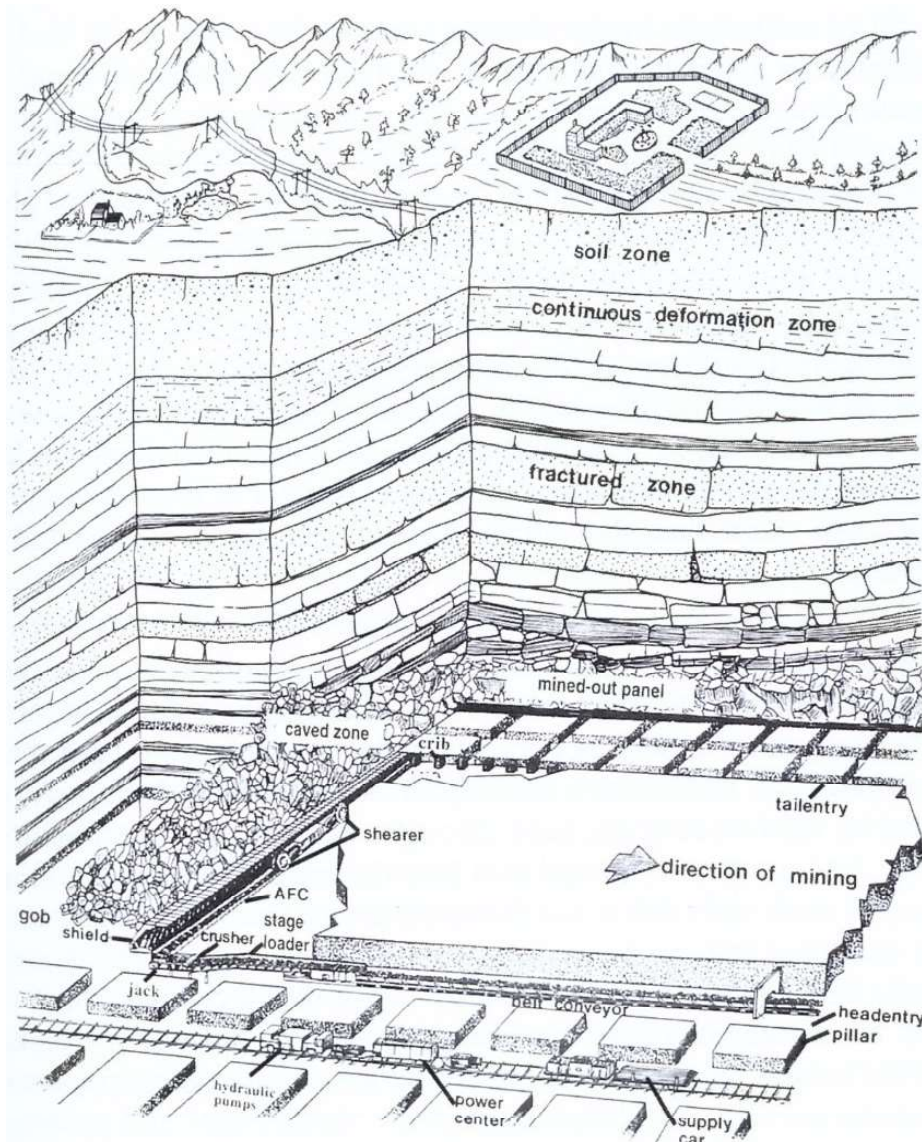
Cut-away of Longwall Panel with equipment and overburden movement (Peng 2006)
